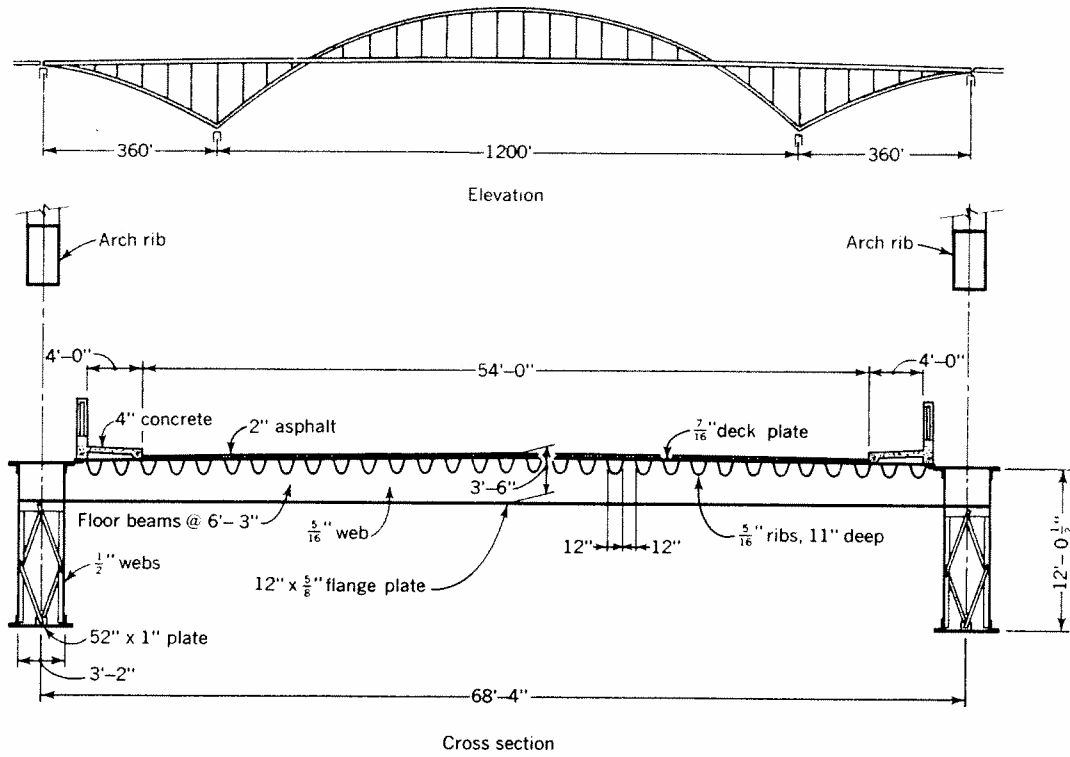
Port Mann Bridge in Vancouver, B. C., Canada (under construction)
